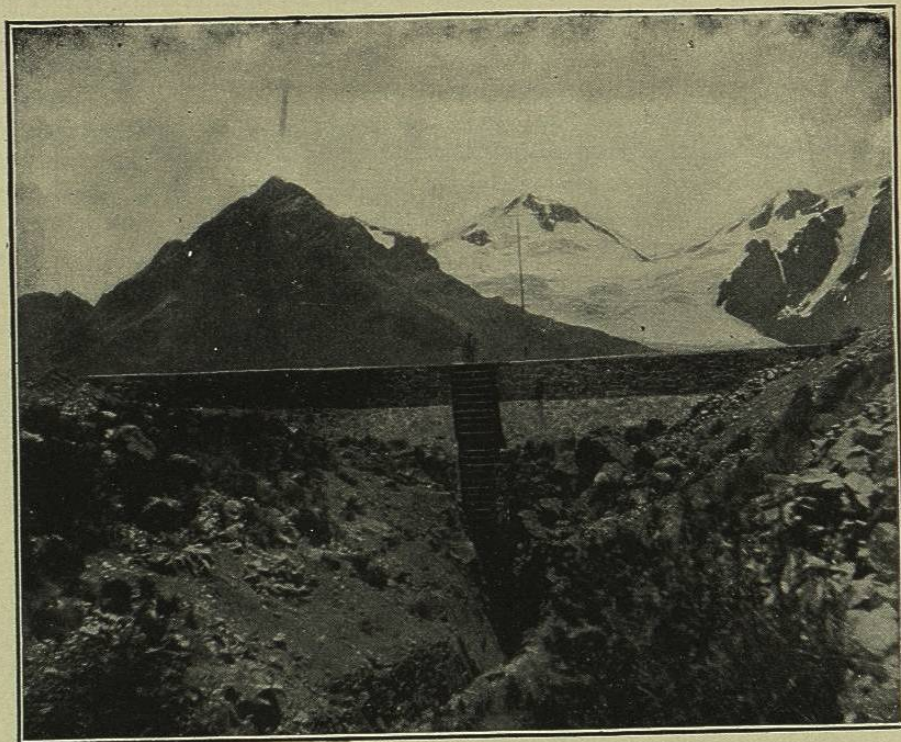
CARPA DAM, PERU, SHOWING TYPICAL OUTLET CUT, FILLED WITH STEEL BULKHEAD, GLACIER IN BACKGROUND.
